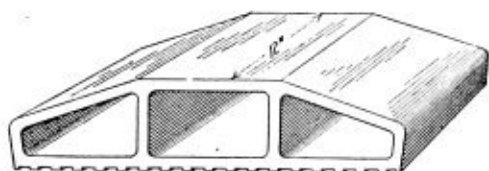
"Barry" Type of Hollow Tile for Floor Construction.
